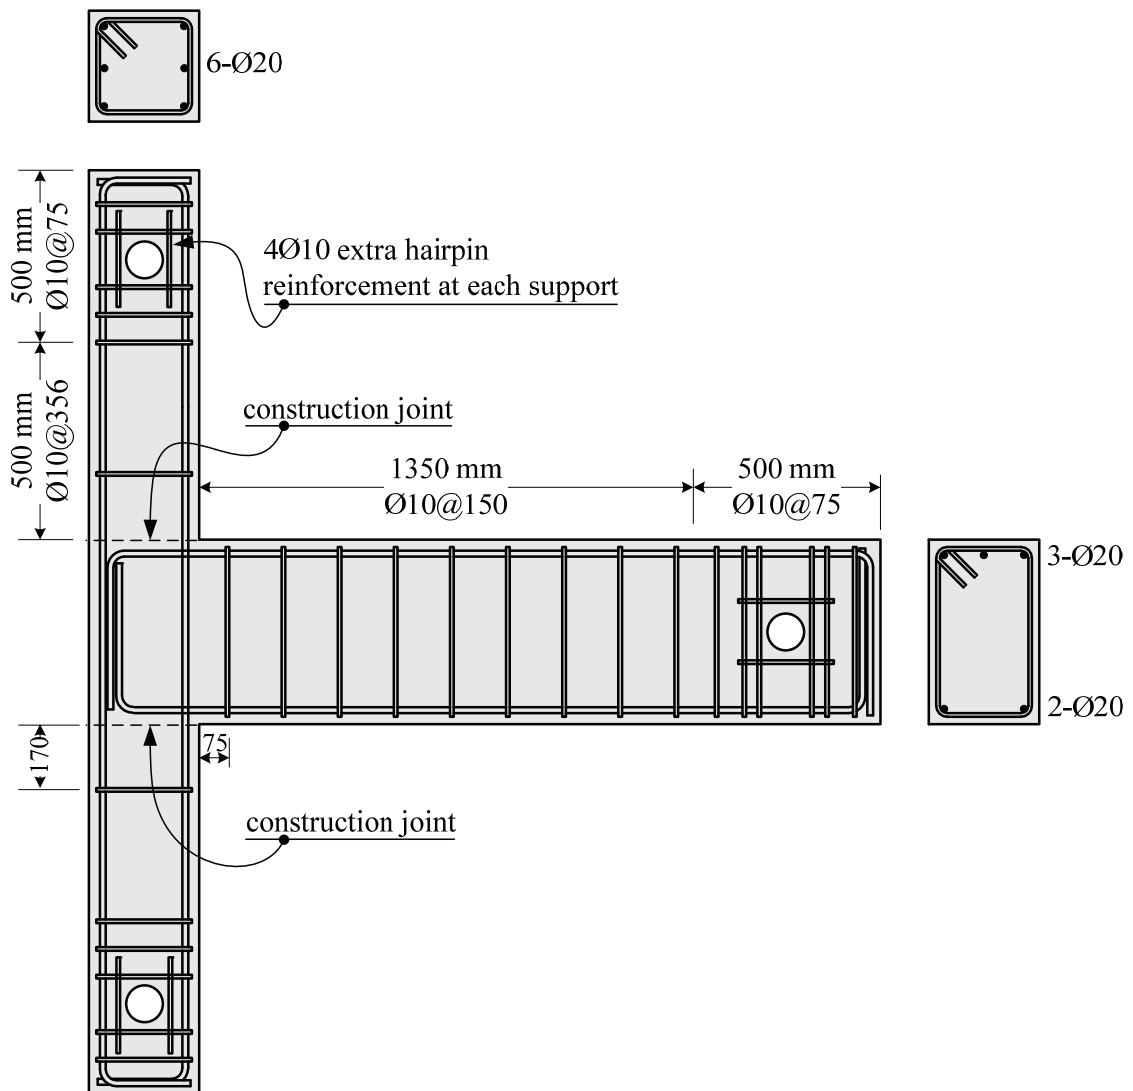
Steel reinforcement detailing of US1, US1-FRP1 and US1-R-FRP1
